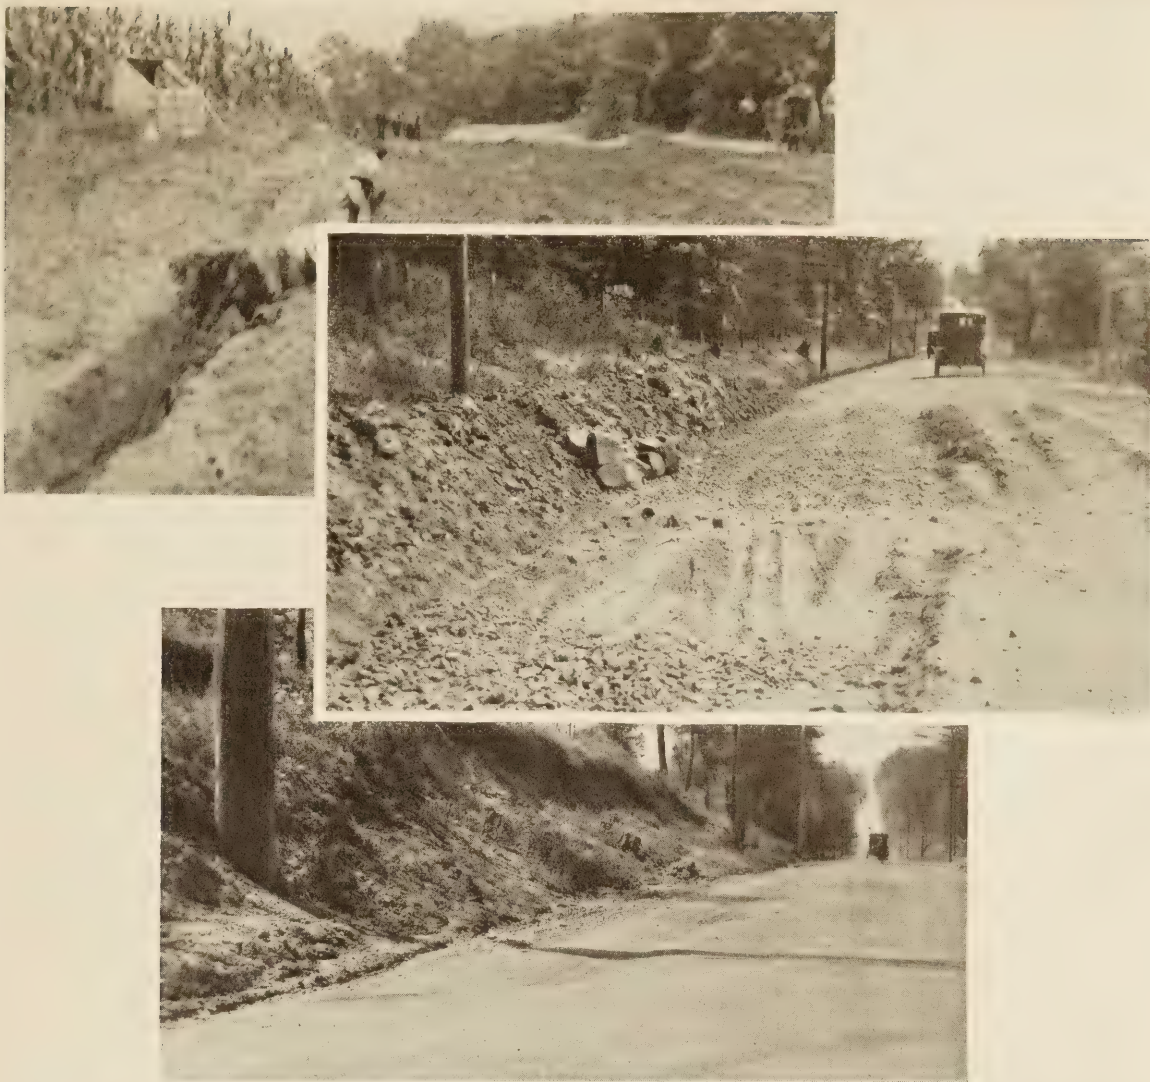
THE TOP PICTURE SHOWS A DRAINAGE TRENCH WHICH INTERCEPTED SEEPAGE COMING FROM UNDER THE CORN FIELD AT THE LEFT, THUS INCREASING THE STABILITY OF THE ROAD SURFACE. THE LOWER PICTURES SHOW FAILURES IN CUTS WHICH MIGHT HAVE BEEN PREVENTED BY MEANS OF SIDE TRENCHES SIMILAR TO THAT SHOWN ABOVE
